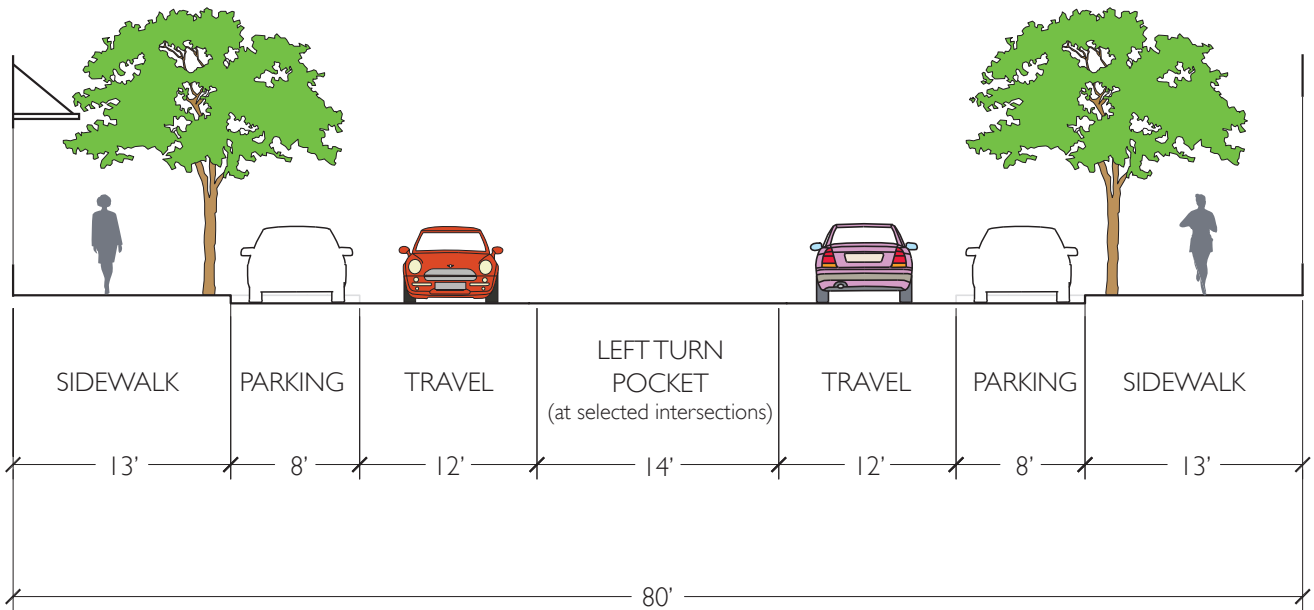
Typical West Broadway Avenue Section (for illustrative purposes only)
